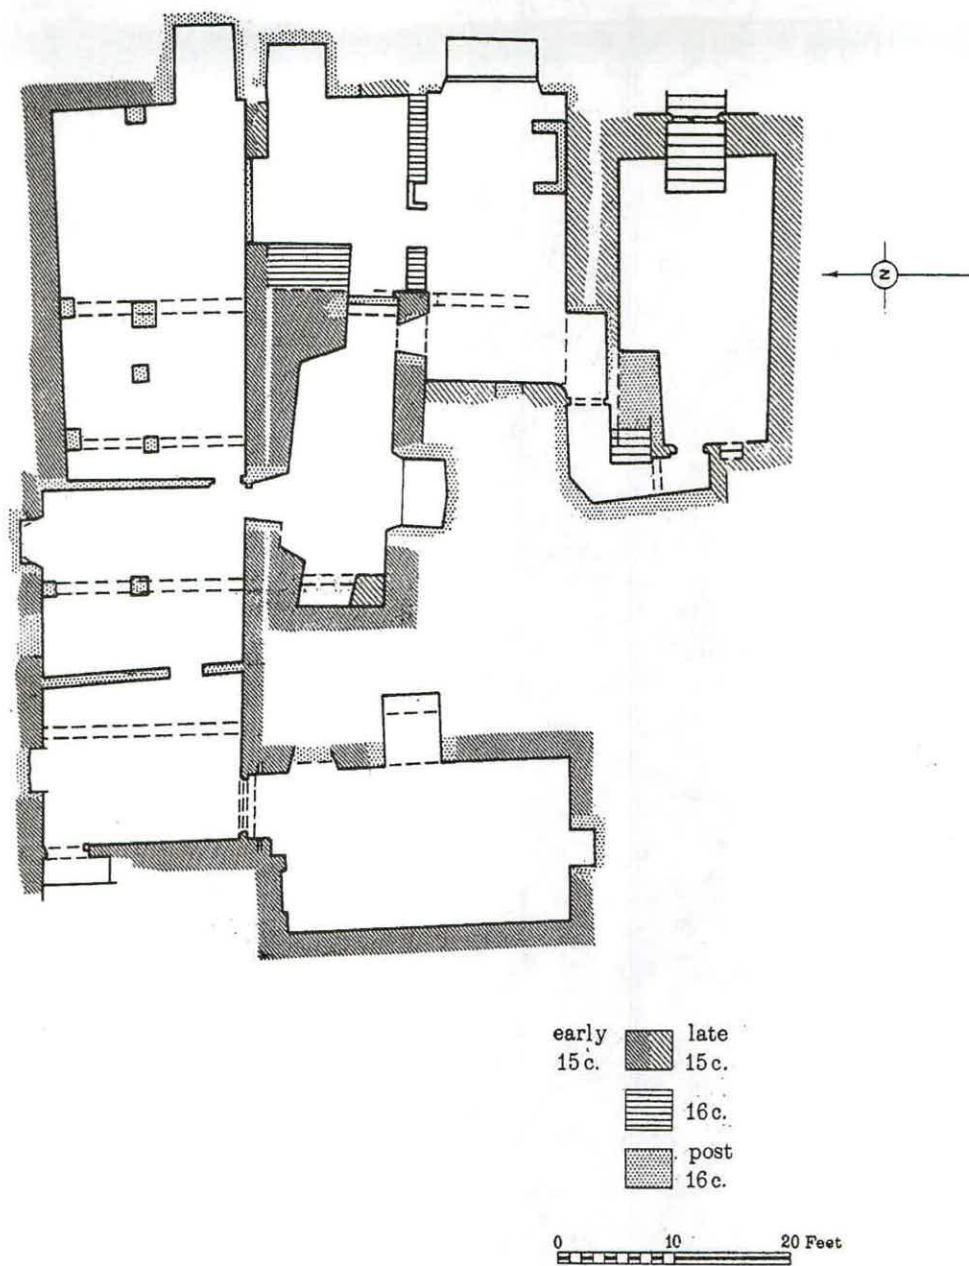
, the plan of the undercrofts beneath Tudor House (Faulkner, 1975, fig. 30)
